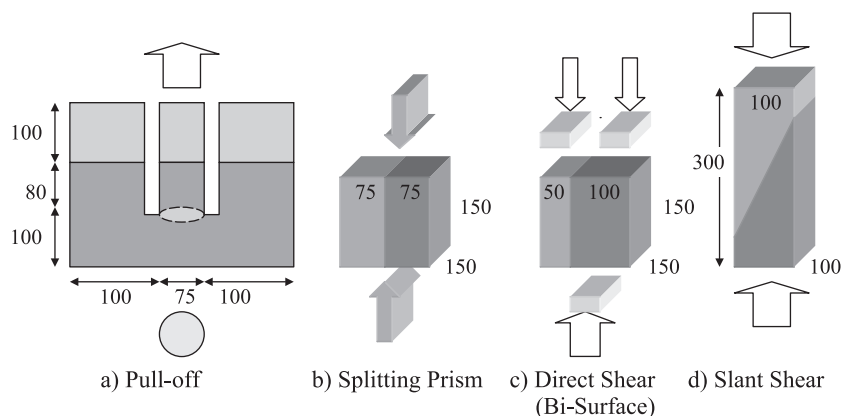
Dimensions of tested specimens in millimeters (25.4 mm = 1 in.).
